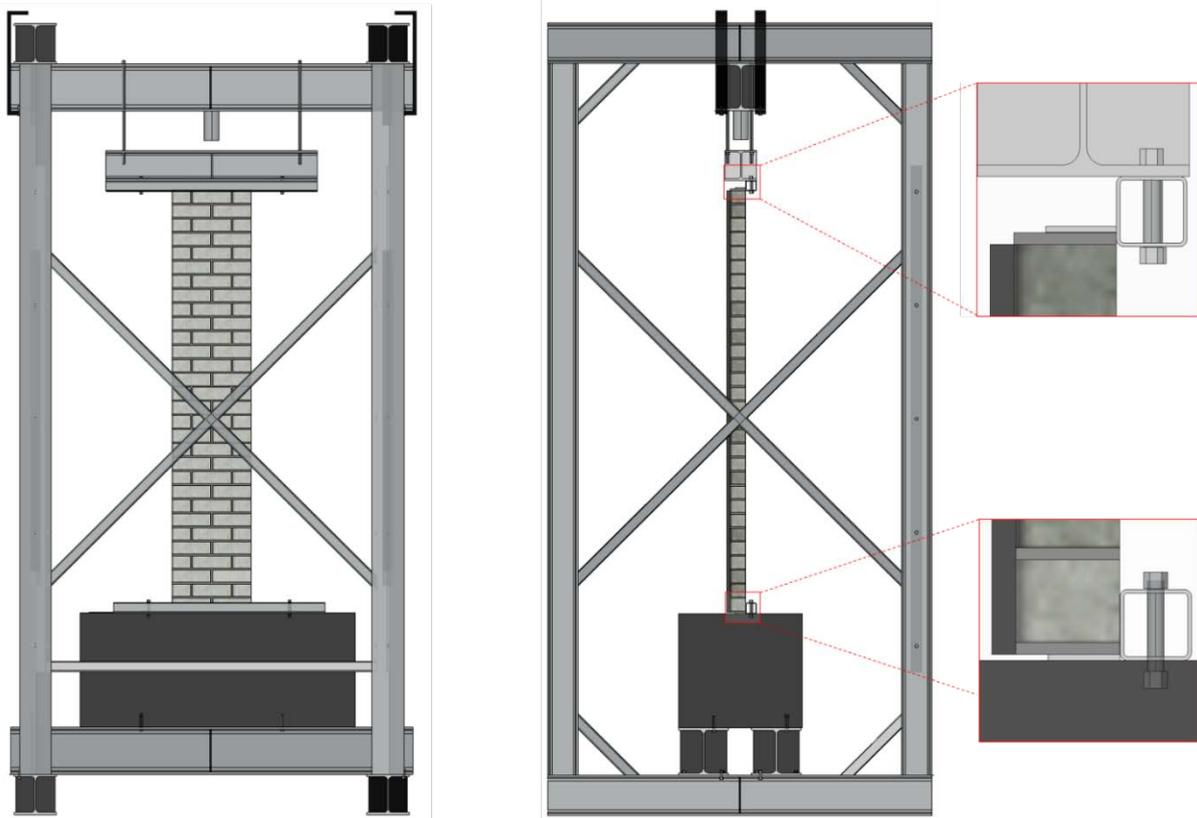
Rig for testing walls in bending and vertical axial loading.
